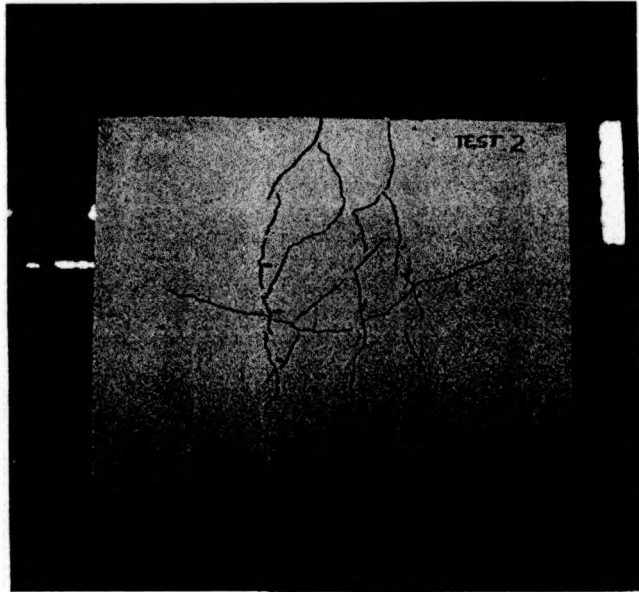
Concrete cracks pattern (PT2)
